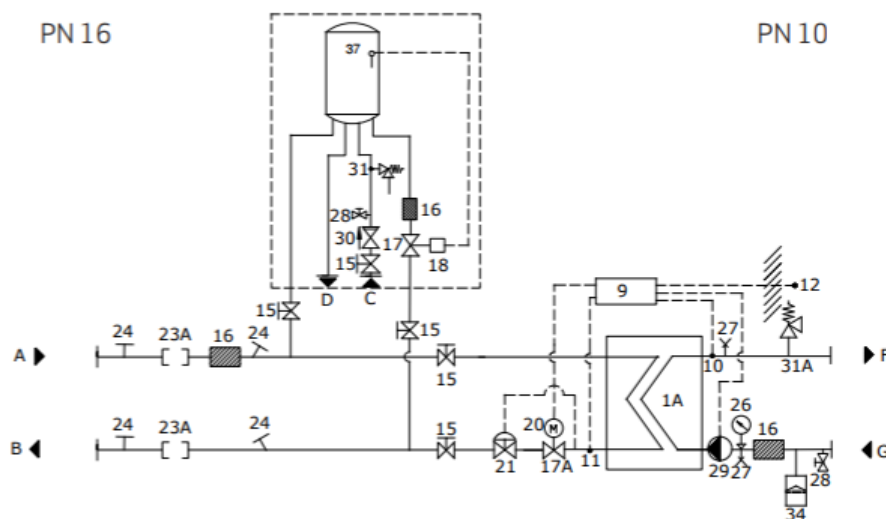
Existing substation with DHW storage tank on the secondary side and indirect SH connection
